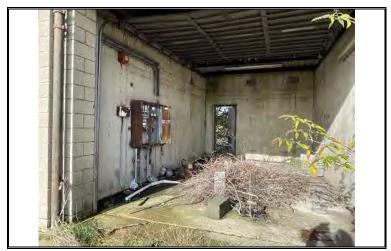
/1048/R1/P30 – Inside a building on the western side of the site.
